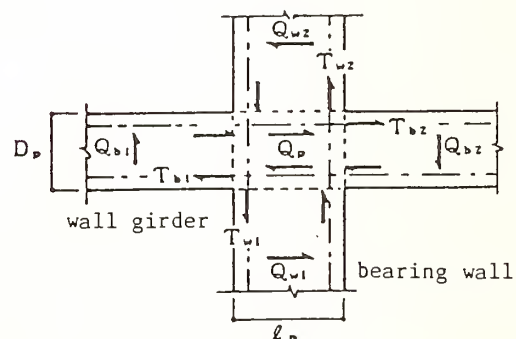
Stress at Bearing Wall-Wall Girder Joint
